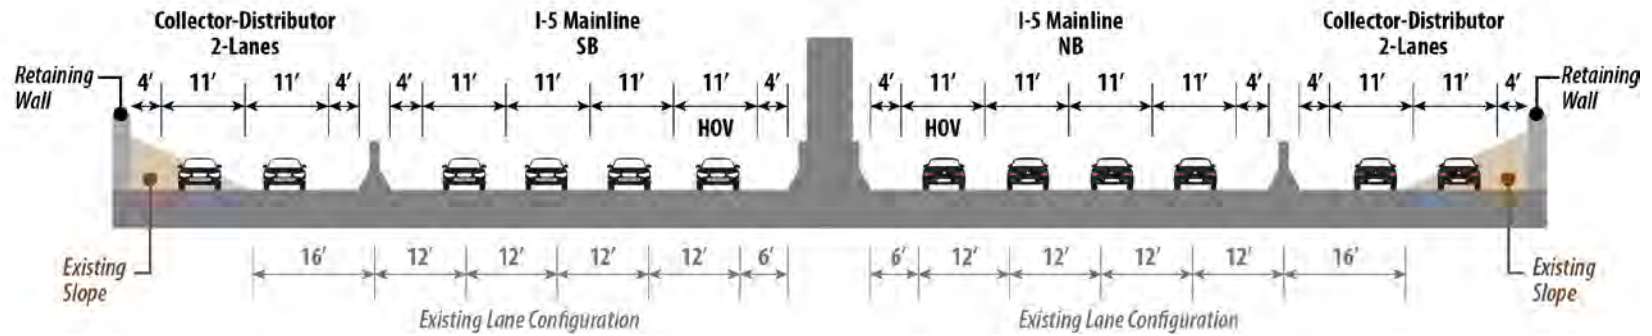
I-5 Practical Design Cross Sections – Collector-Distributor at S 48th Street Bridge
